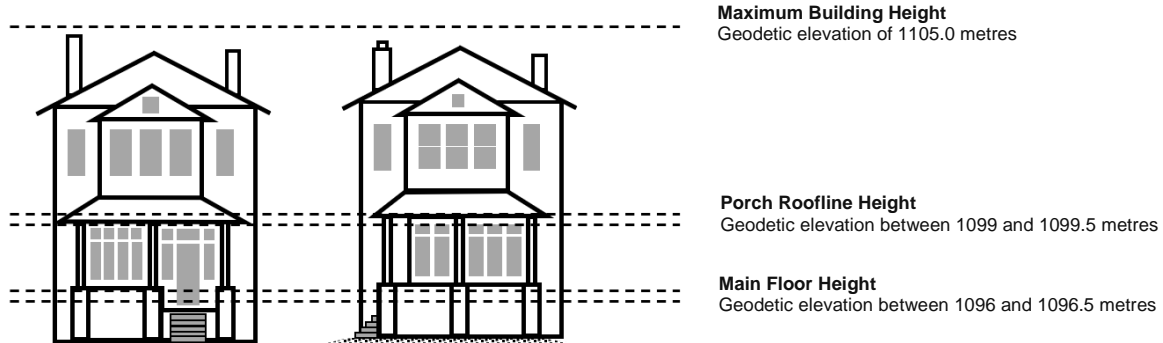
Front Elevation - Showing Allowable Building Height for Site 2
